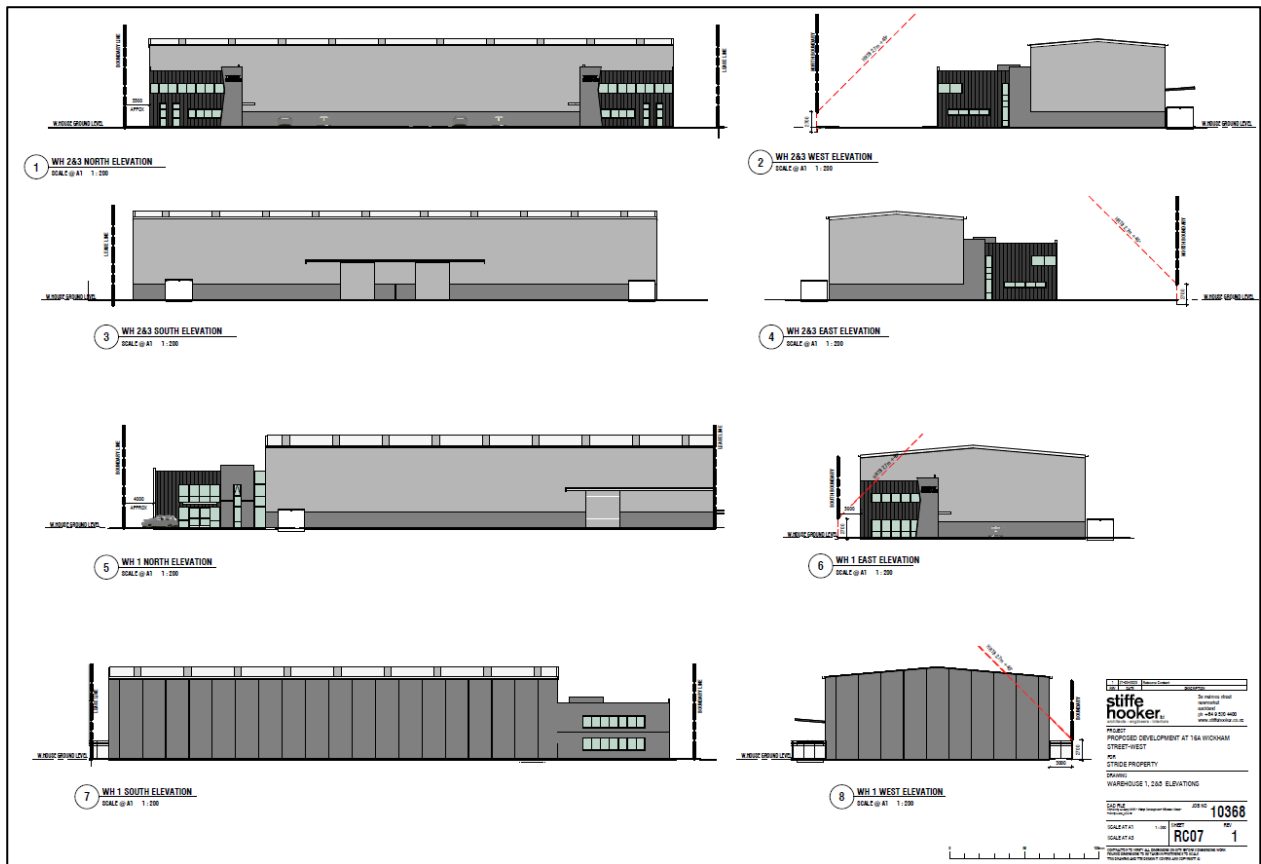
Proposed Elevations Plan of Stage 2 buildings
